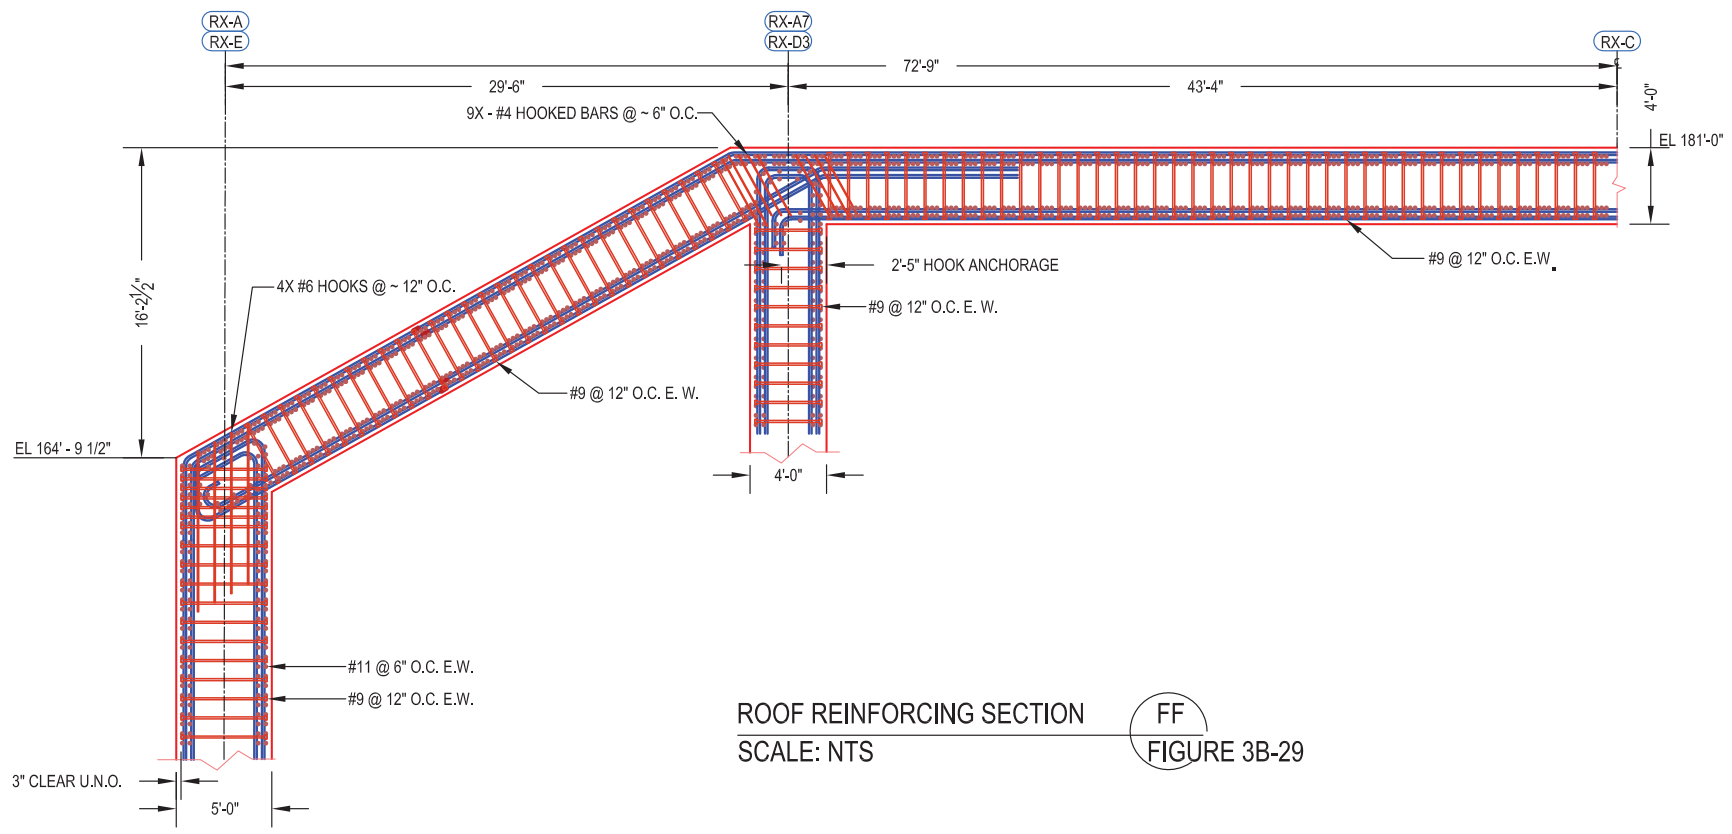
B-30: RXB Reinforcement Section View of Roof Slab
